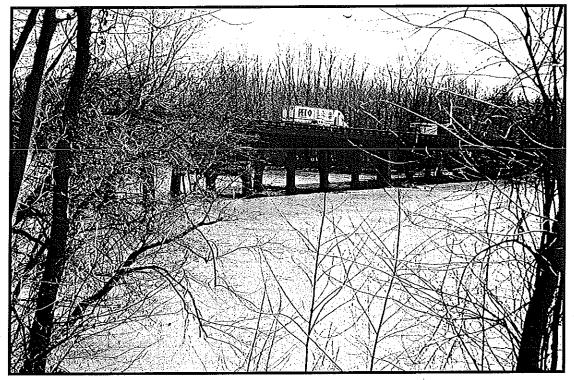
Looking southeast toward upstream elevation of I-85 bridge over the Yadkin.
